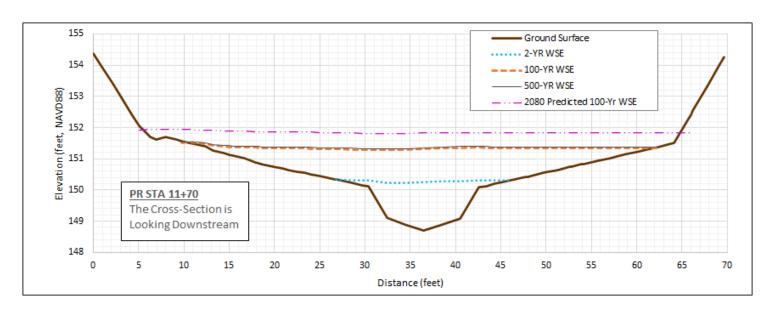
Proposed Through Structure Cross-Section G PR 11+70
